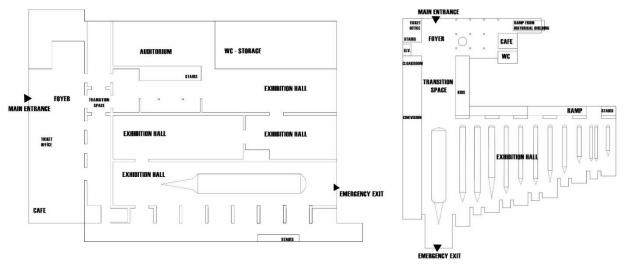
Ground floor plan of Genova Galata Museo Del Mare (left), Ground floor plan of İstanbul Deniz Müzesi (right)
